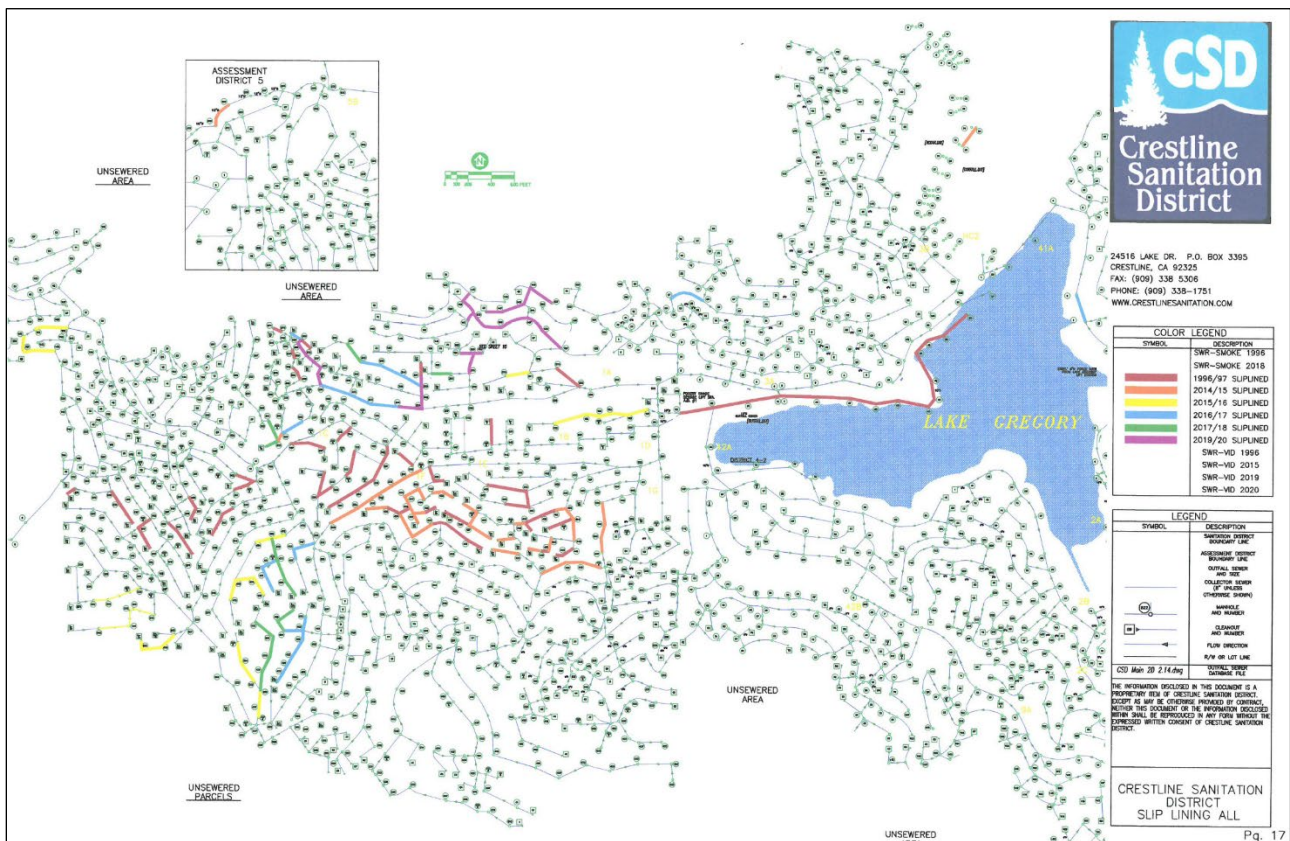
Crestline Sanitation Districts Service Area and Collection System Repairs to Date (FY19/20 in Pink)
